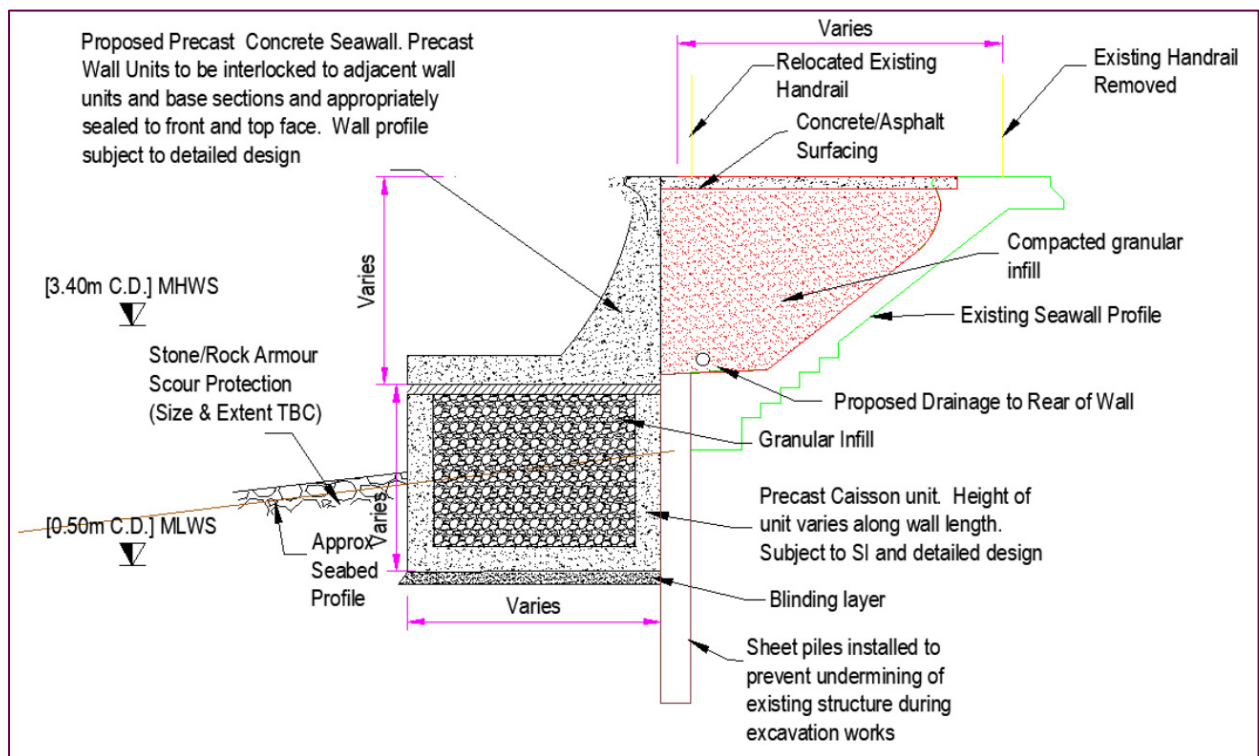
Proposed Section for Middle Section of Proposed Seawall
